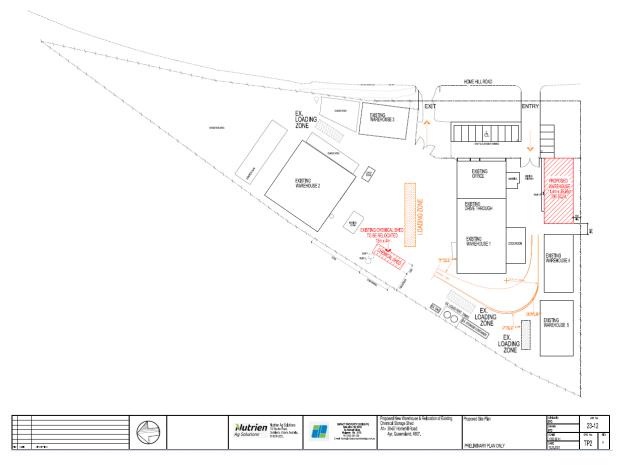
Proposed site plan (Nutrien Ag Solutions, 2023)
